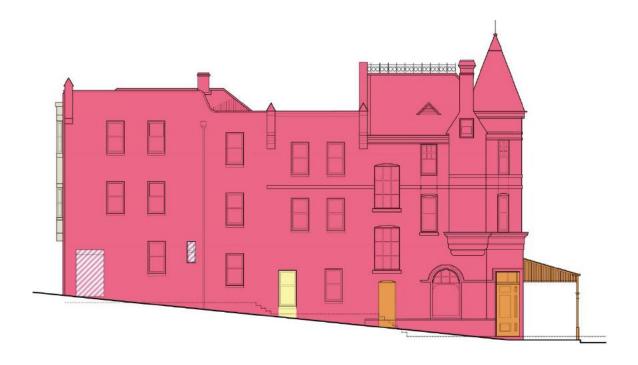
Grading of Significance,, West Elevation, TKD Architects (not to scale).
